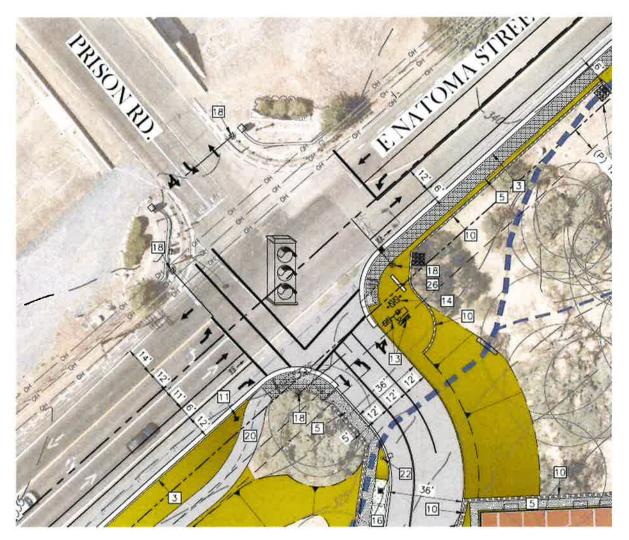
PRELIMINARY ACCESS AND CIRCULATION PLAN
